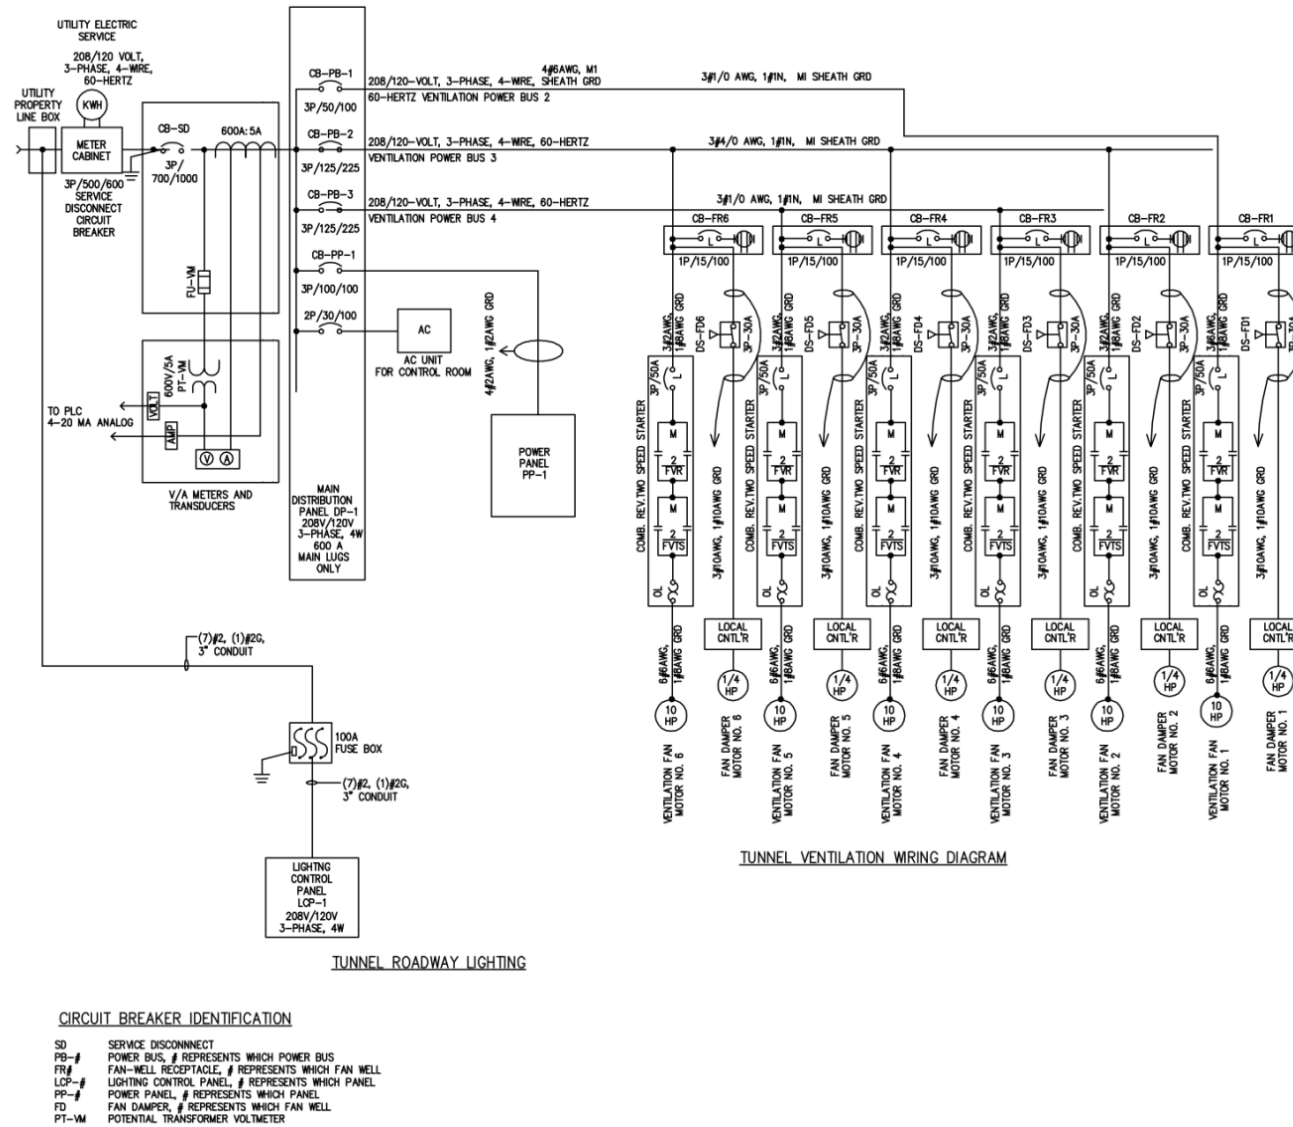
Sample tunnel ventilation and lighting diagram.
